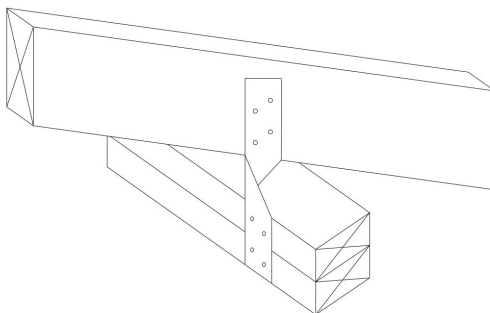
RAFTERS ON MASONRY WALL (TWO TRUSS ANCHORS SHOULD BE USED FOR EACH RAFTER)
